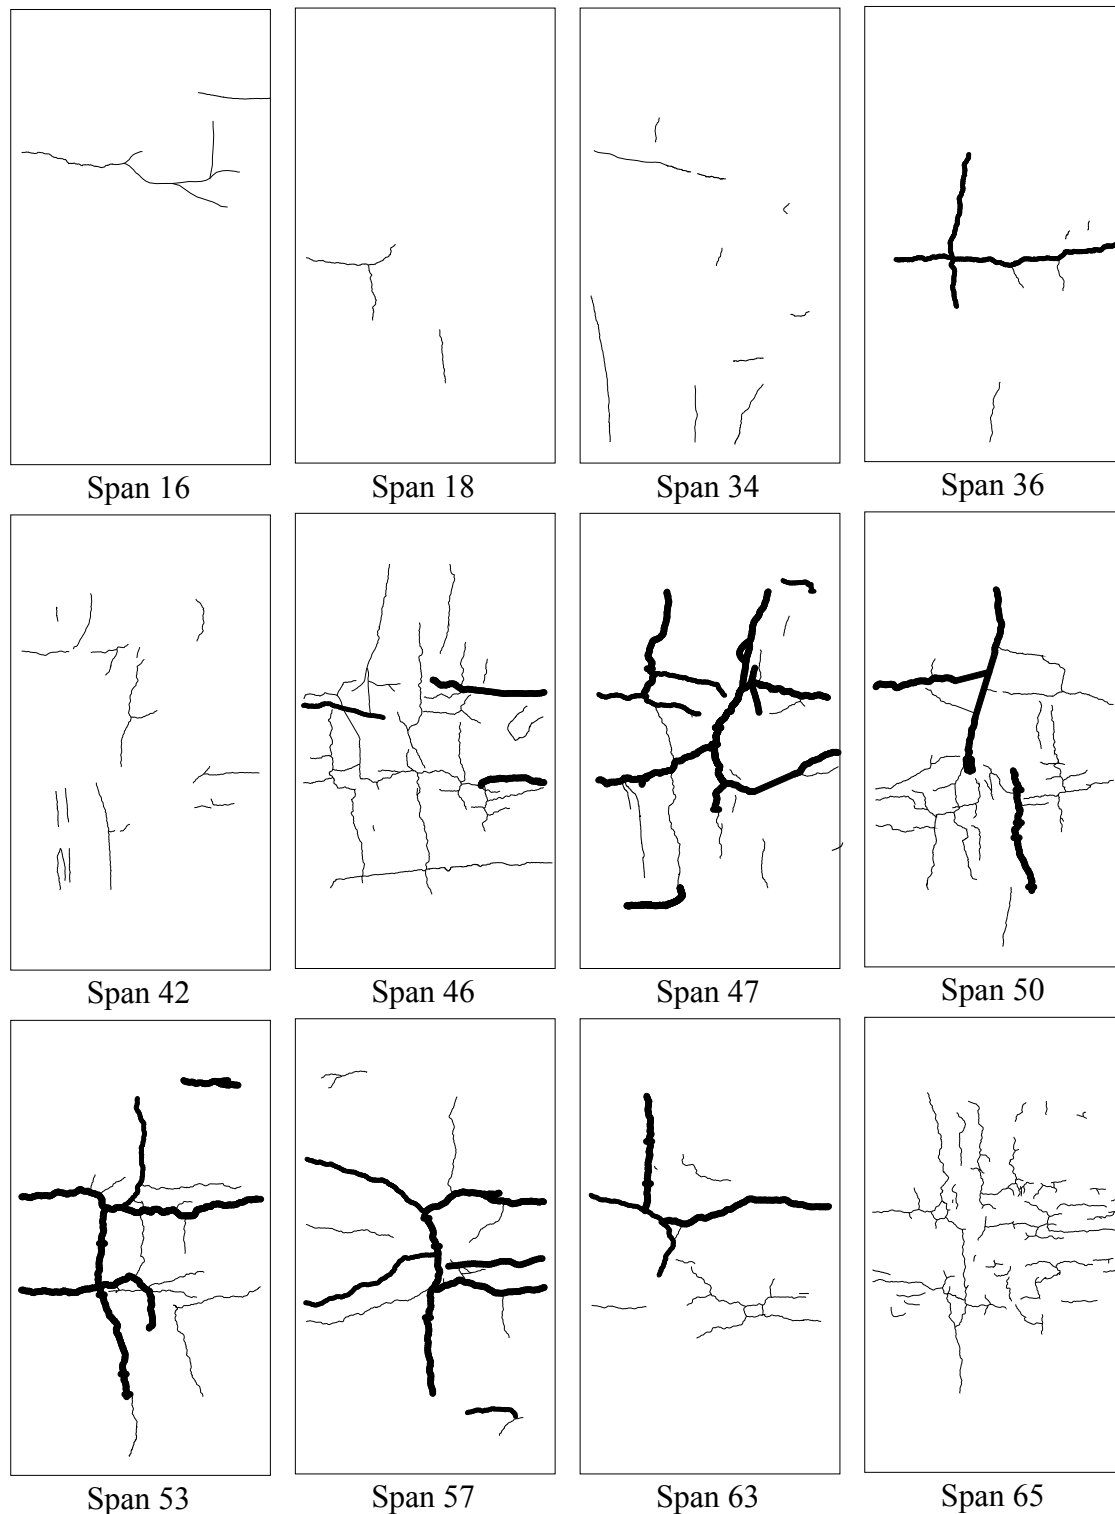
The distribution of cracks in tunnel lining for twelve typical spans
